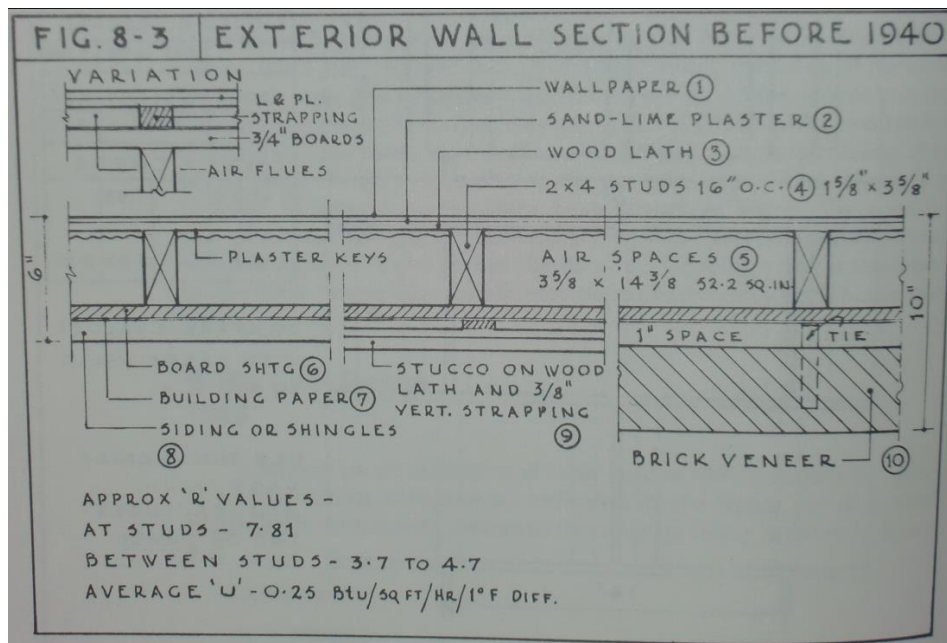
Exterior wall section before 1940. Source: Watson, 1983, p. 68.
